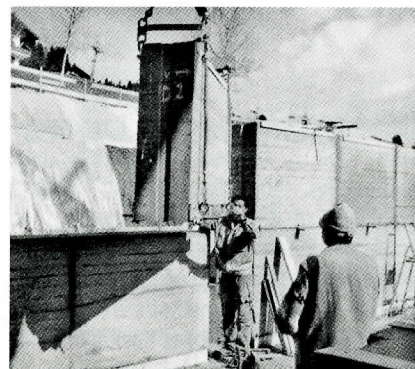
Prefabricated rammed earth wall. Source: Rauch (2007).
